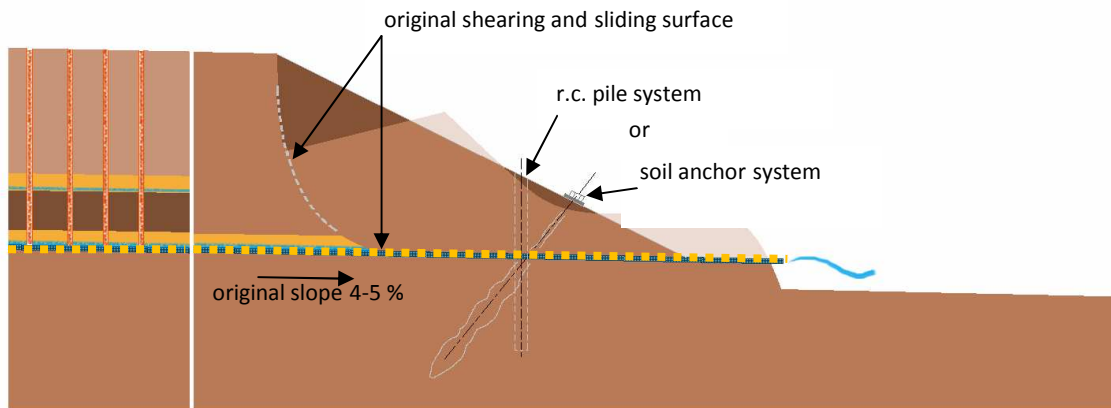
Sketch of an embankment cross section with the deep drainage system showing simple slope leveling and r.c. pile or soil anchor systems to increase the safety against sliding
